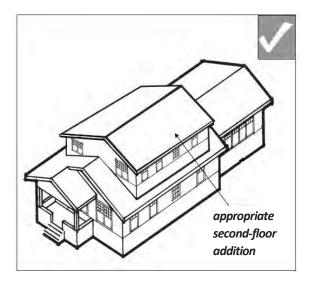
When adding a second-floor addition to an existing single-story bungalow, it should be in scale and character with the primary structure.
